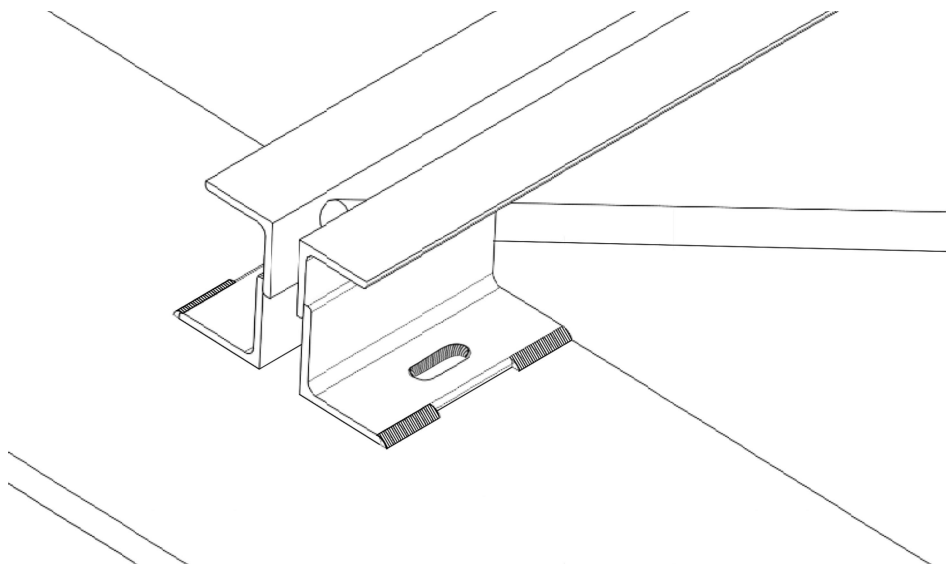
Detail for welding bearing seats detailed for a bolted connection
